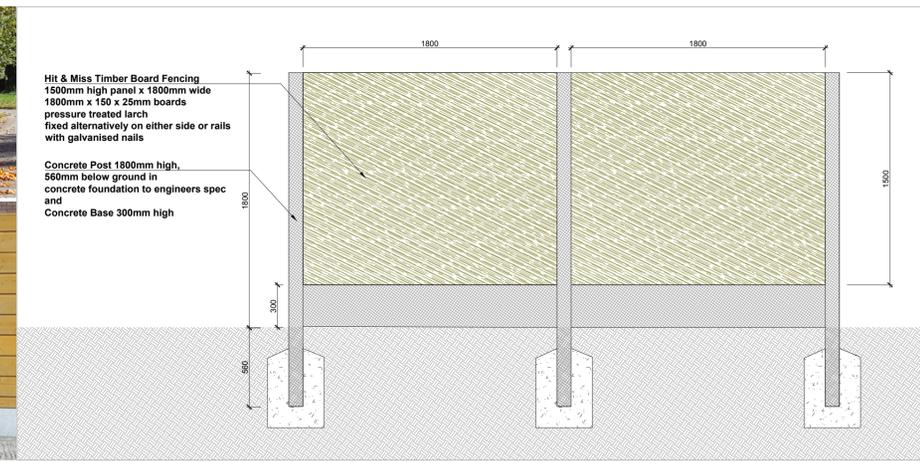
C - BOUNDARY TYPE 2 - INTERFACE BETWEEN POS AND PROTECTED STRUCTURE
